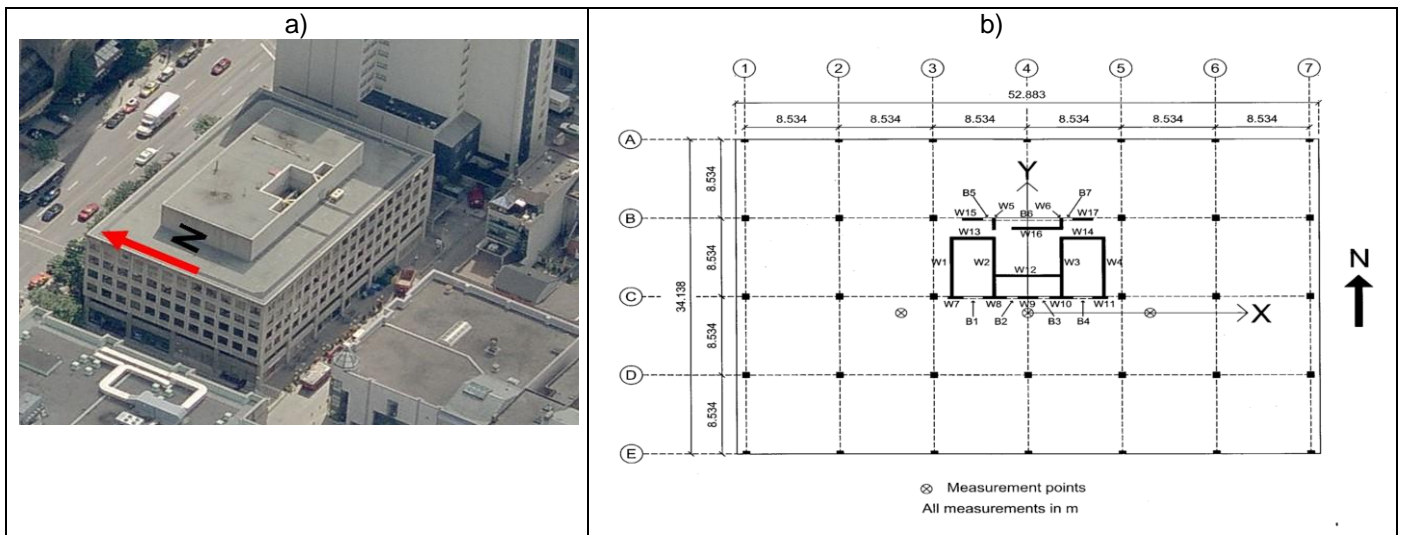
a) Bird's eye view of building # 18; b) Typical floor plan (Gilles, 2011)
